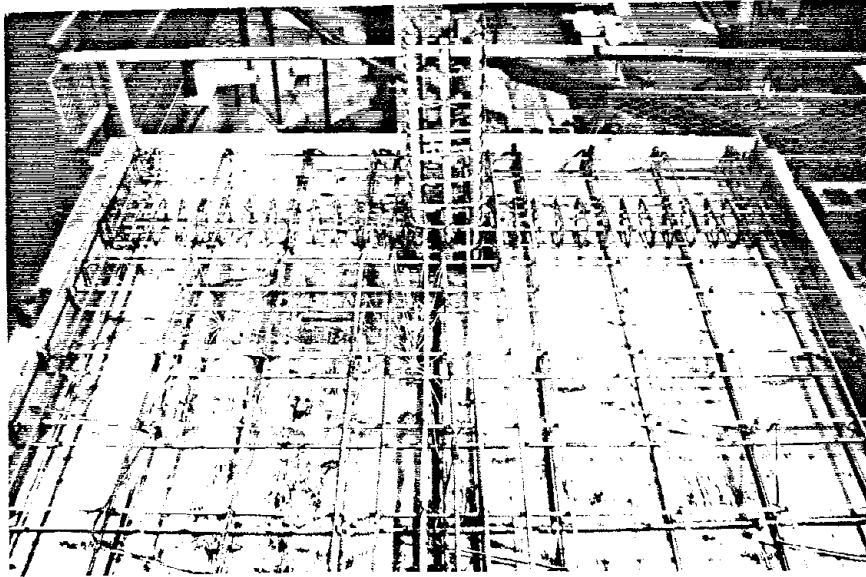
Specimen 5S0 - Slab overhang reinforcement
